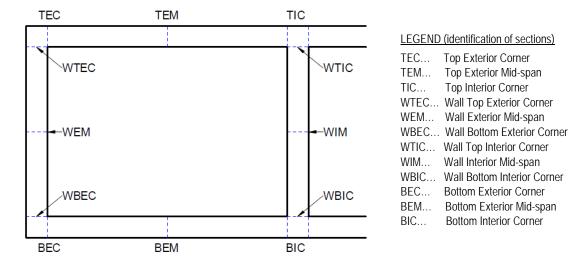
Moment Critical Sections in a Reinforced Concrete Box Culvert with no Haunches (Lawson *et al.*, 2009)
